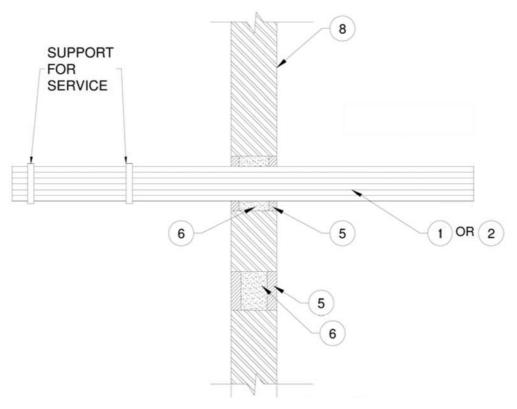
Typical details for cables protected with 3M IC 15WB+ sealant for masonry walls
